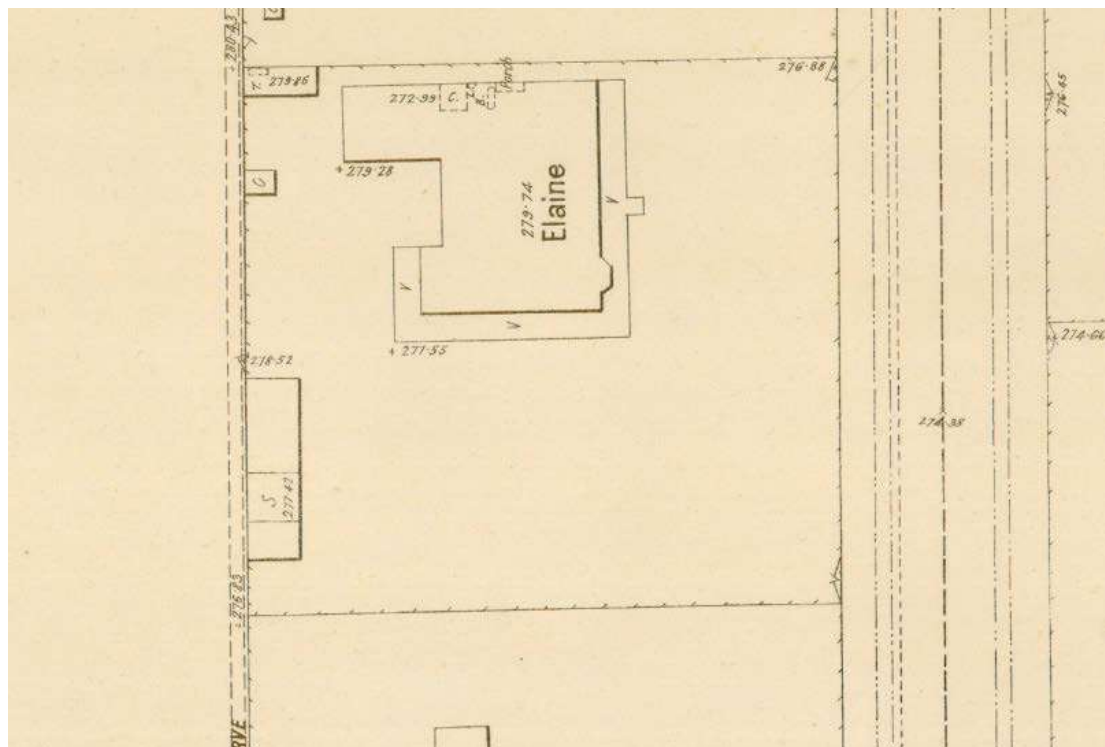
MMBW detail plan no. 1992, dated c1905, showing the timber house at 37 Wentworth Avenue is on a comfortable double lot, with a return verandah (Source: SLV).
